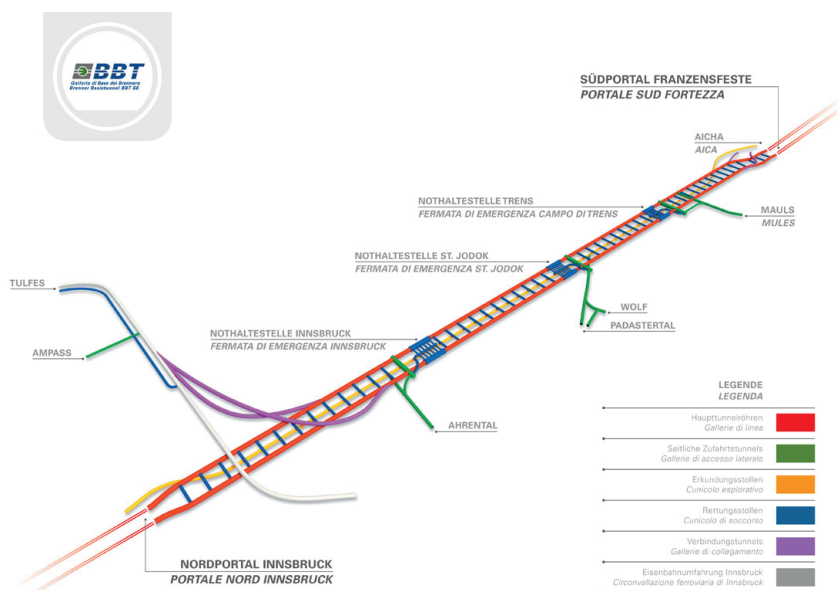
Schematic of the new Brenner tunnel (under construction). Source: BBT-SE
